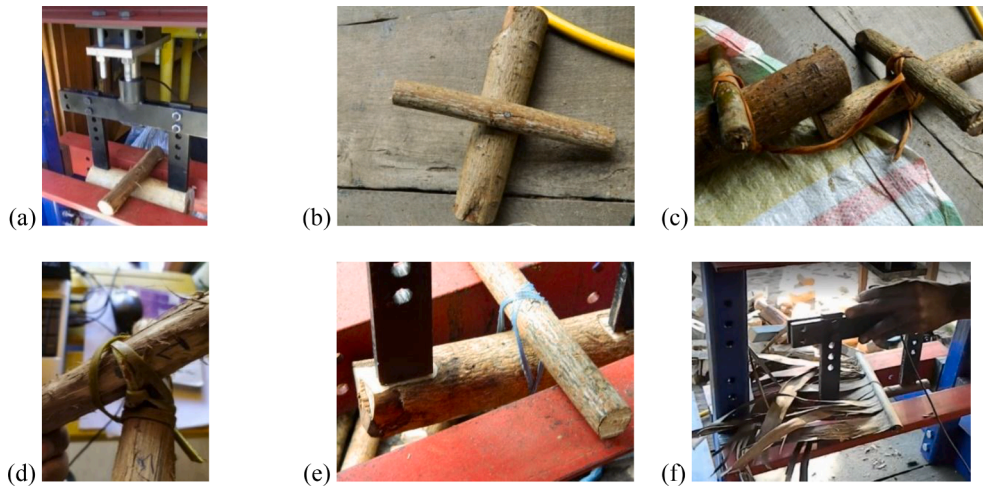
Purlin-secondary member connections (a) specimen test setup, jointed by (b) nail, (c) Zavy (d) Traveller's palm leaves, and (e) Mosquito-net ropes, and (f) secondary member-roof cover (palm leaf petiole) connections test setup.
